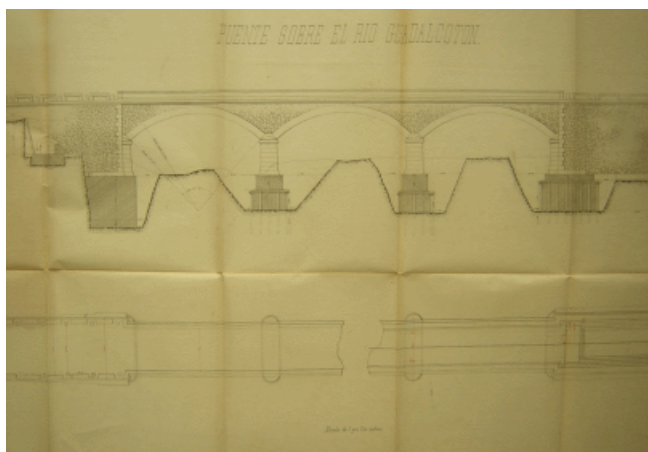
Bridge over the Guadalcotón River, with Three 15-m-span Arches Built of Massive Brick and Concrete, on the Primary Road from Alcaudete (Jaén) to Granada. Fermín Bollo, Civil Engineer. Replaced by a bridge of Reinforced Concrete in 1940
